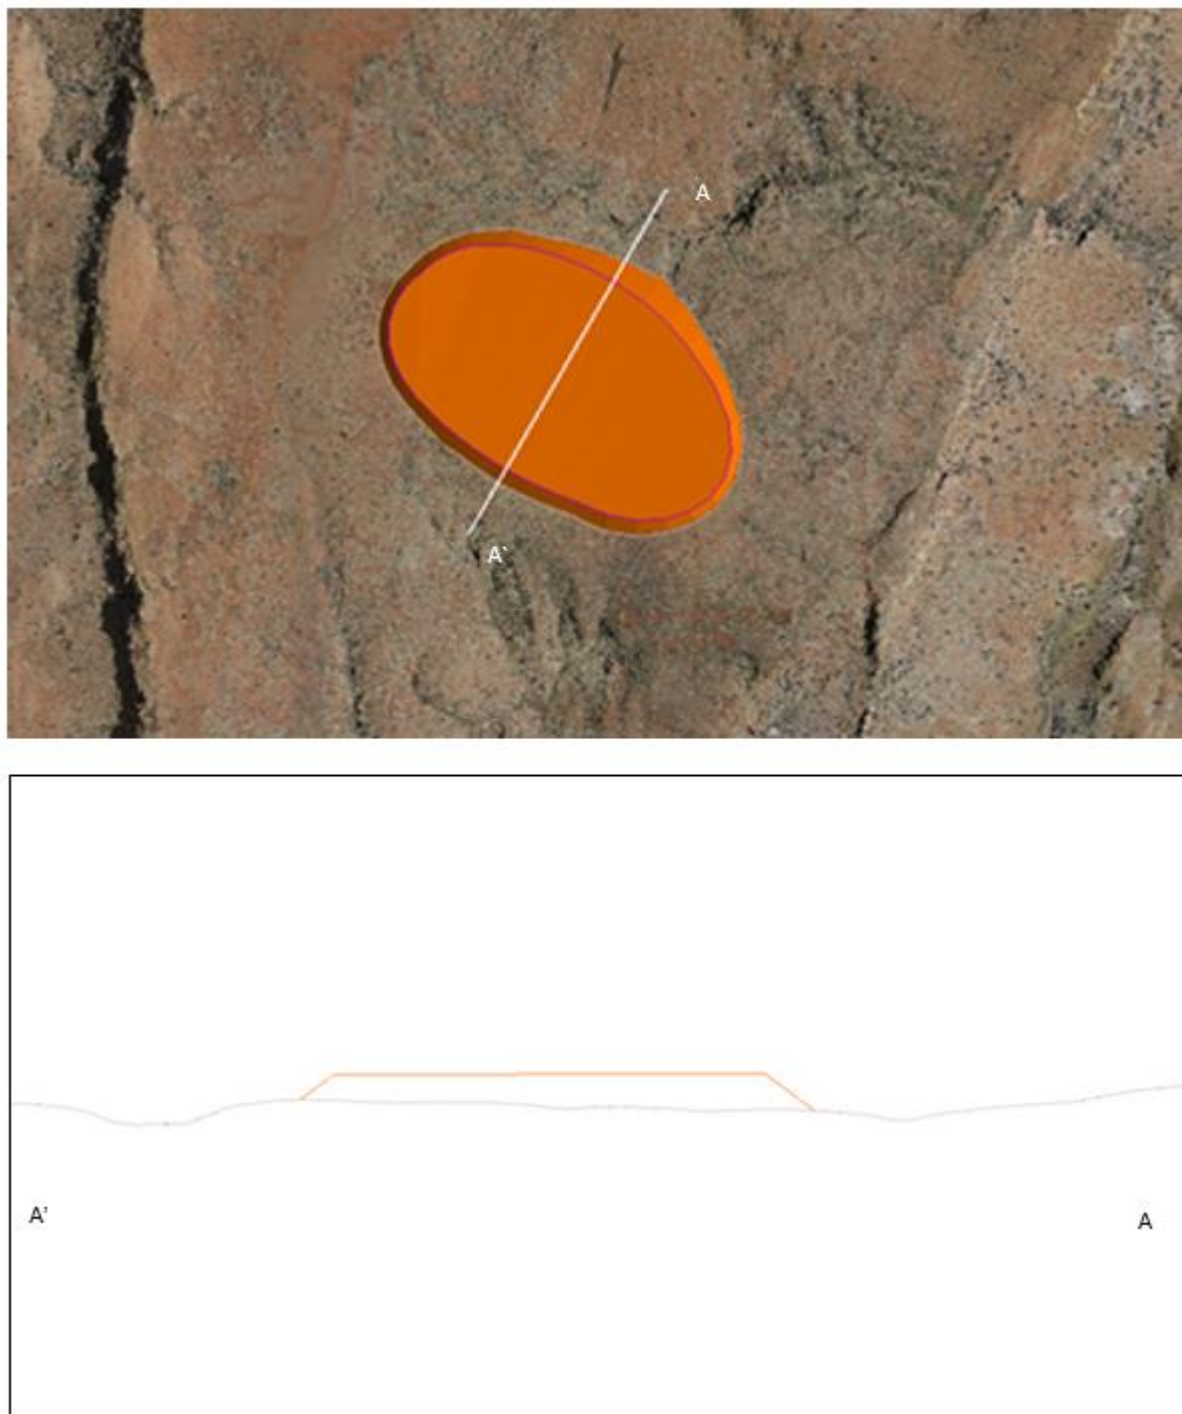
Split Rock Low Grade Stockpile Plan View and Cross-Section (looking north-west)
